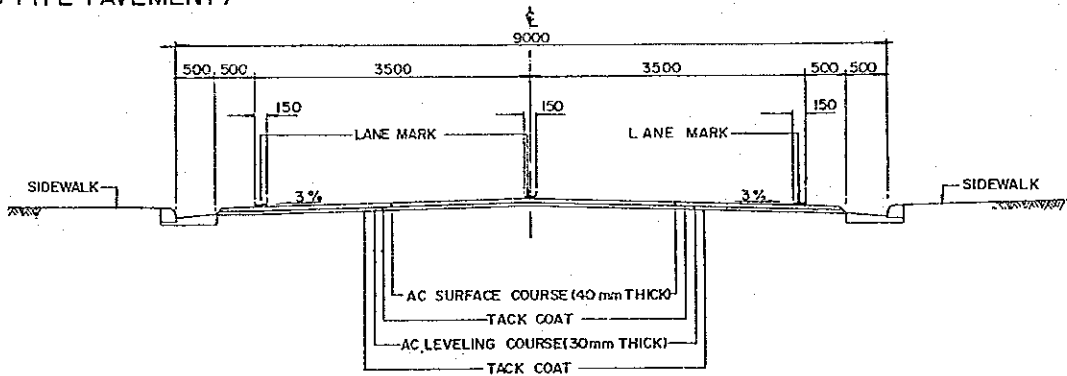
TYPICAL CROSS-SECTIONS (2/4)
